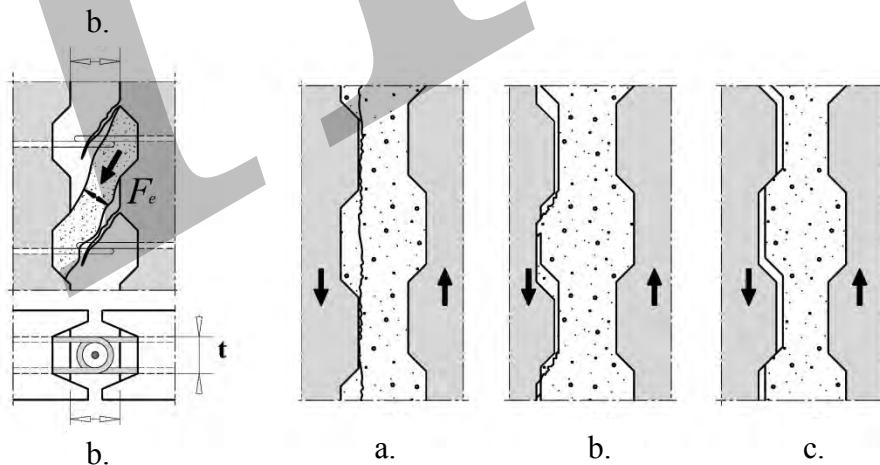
Model for the transfer of shear forces and typical failure modes in indented joints; a. cracking of the infill concrete along the indentations, b. crushing of the compression struts, c. opening of the joint.
